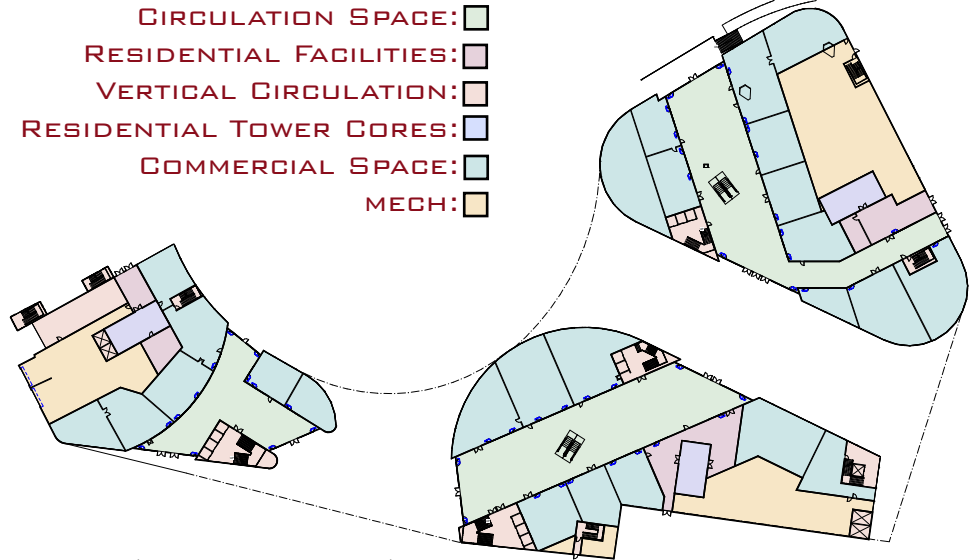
| LEVEL 1 FLOOR PLAN | DJV
